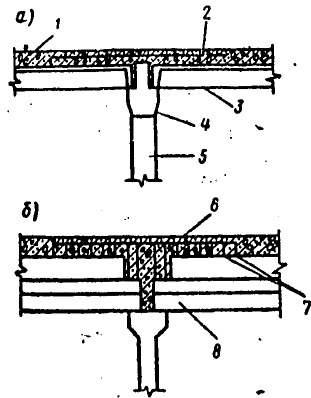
Installation of above-pier reinforcement in shelter's precast-monolithic overhead cover:
